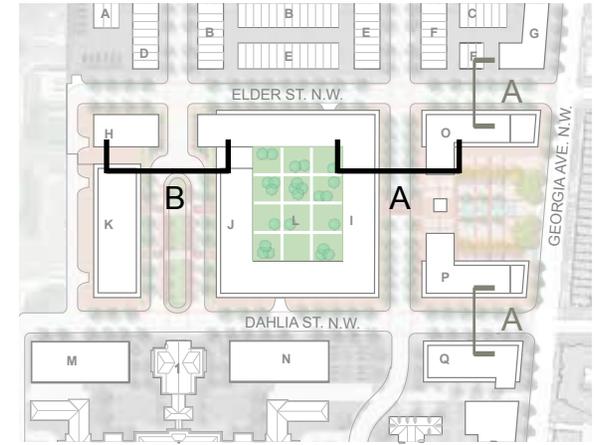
Street Sections Key Plan - Town Center. Source: Perkins+Will
